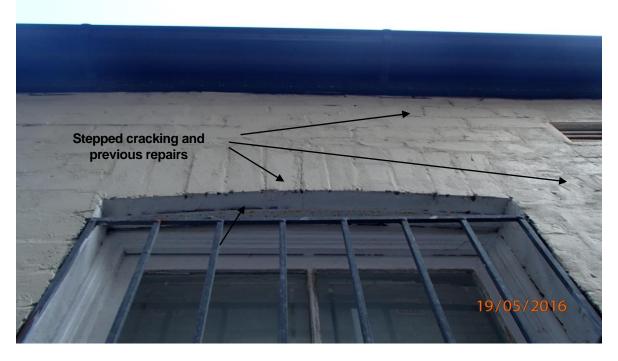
shows stepped cracking and previous repairs to the brickwork and displaced mortar to the top left hand of the Bathroom window.
